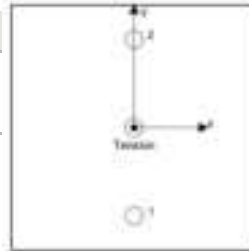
Baseplate connection using post-installed chemical anchors
